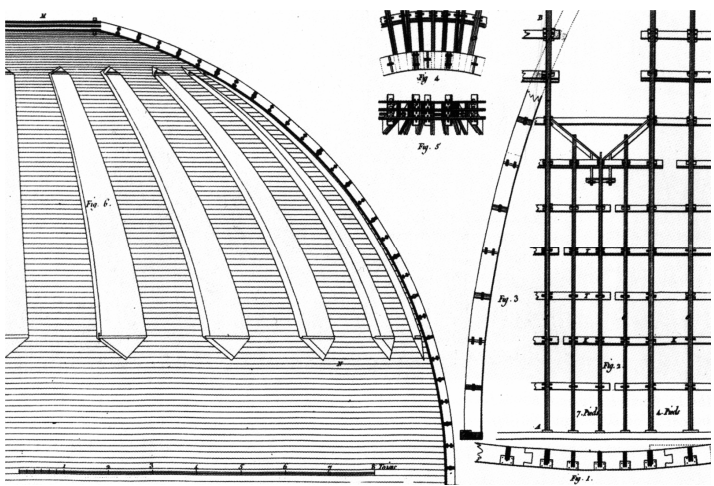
Timber roof structure of the Halle au blé (Krafft 1805, plate 71)
